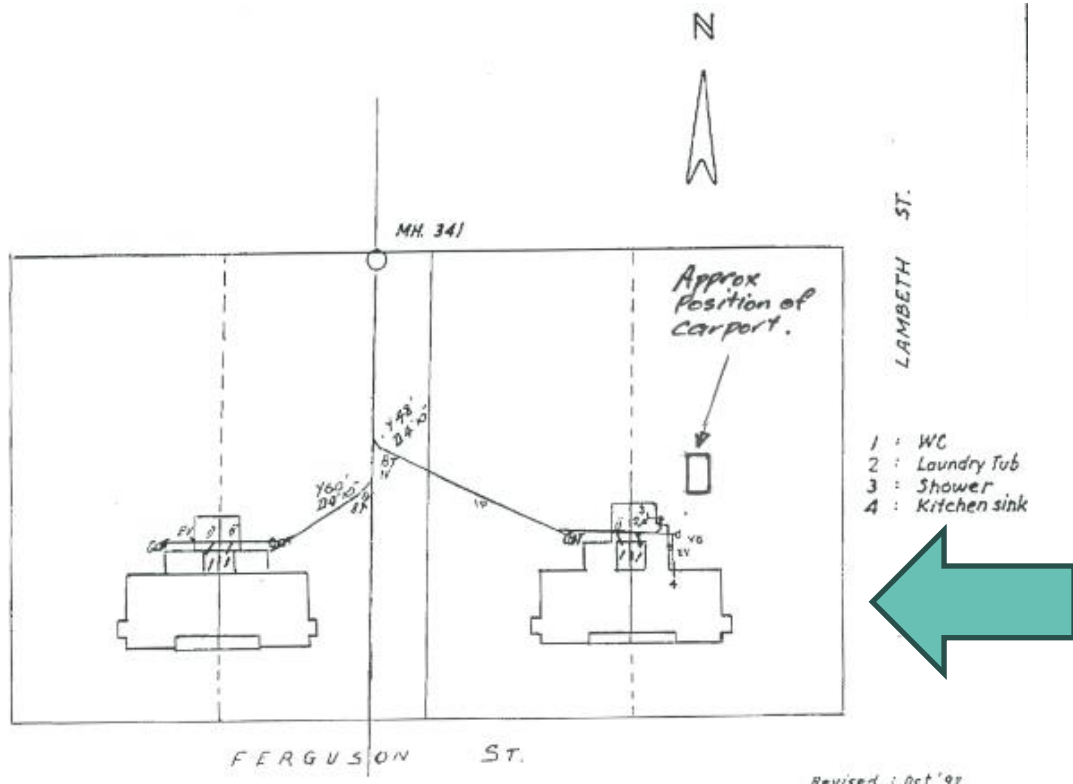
Extract of revised 1992 plan of house drainage report from 1938, with the subject site outlined.
